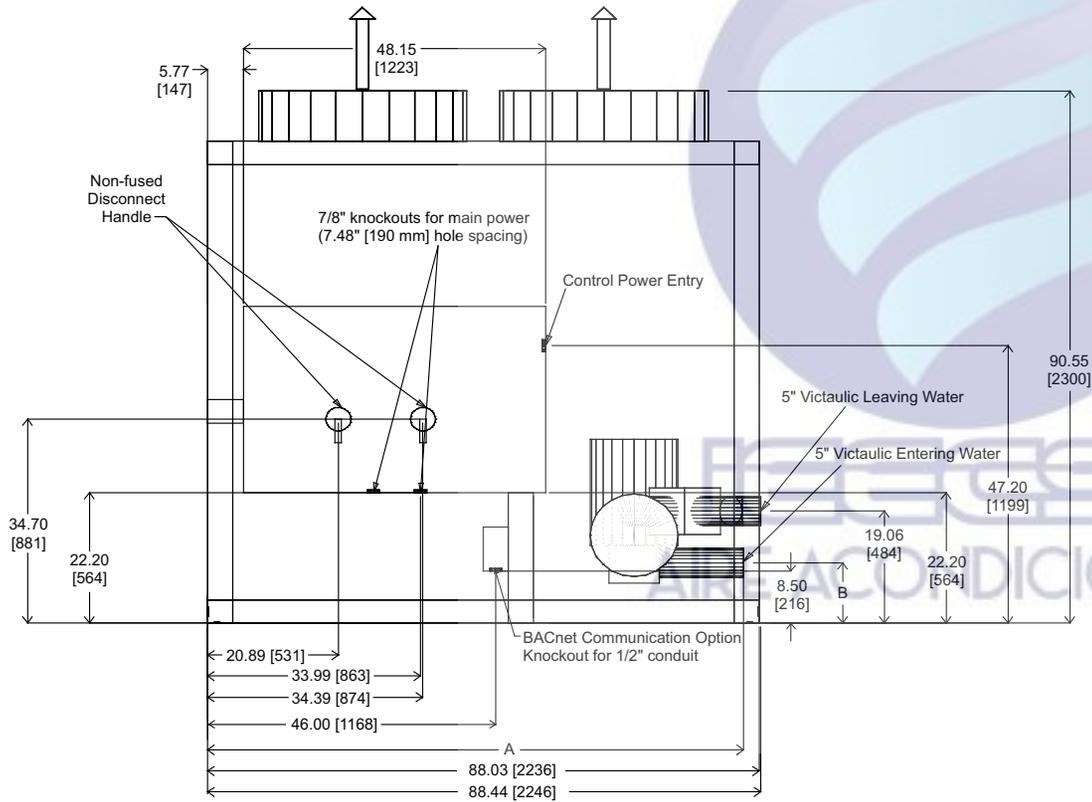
30XA090, 100, 110, 120 Air-Cooled Liquid Chiller Dimensions with Pump (cont)
